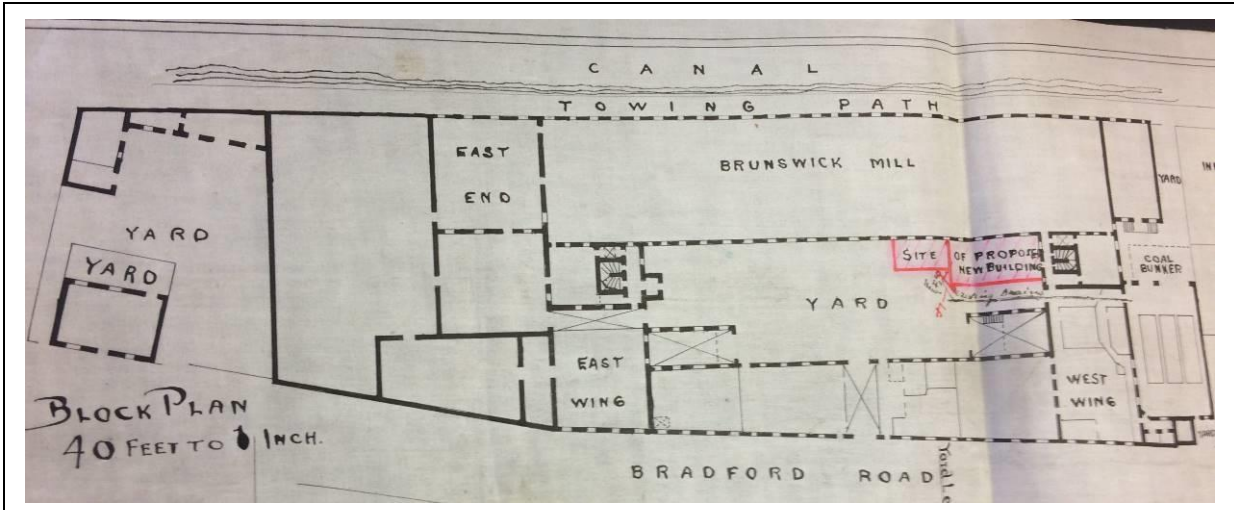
1906 ground floor plan of the Site (looking south), showing the intended location for the new engine house, which was not built (outlined red).
